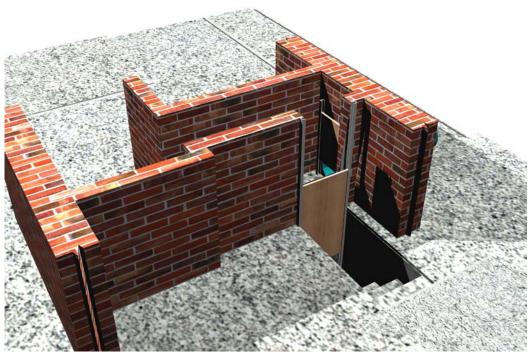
3D View of proposed model with over flow gate and bypass opening
